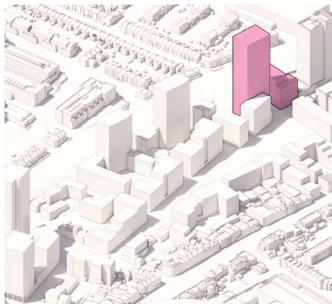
Proposed illustrative massing highlighting Marker Building Architectural Approach
